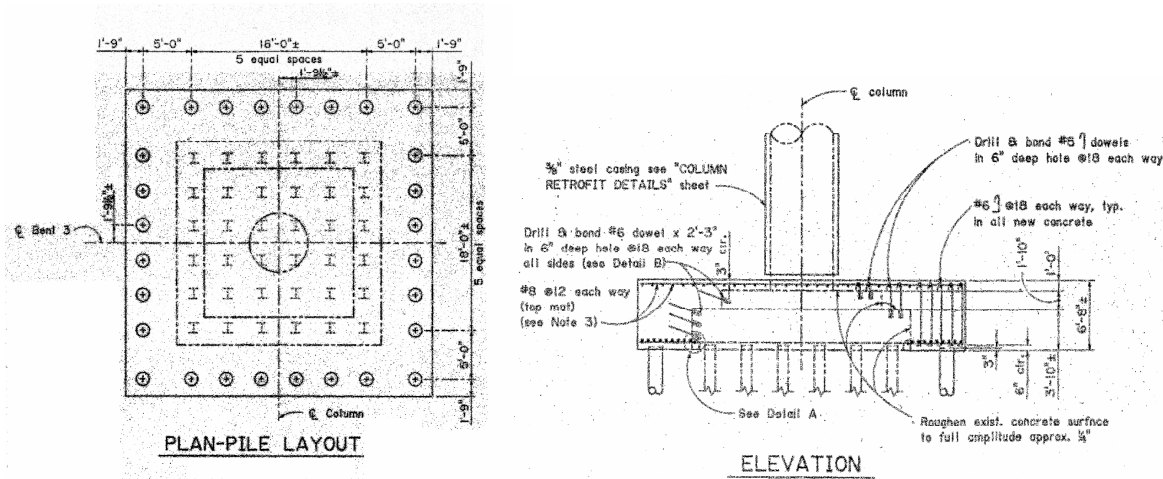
Typical Foundation Underpinning Detail (PB, 1993).
